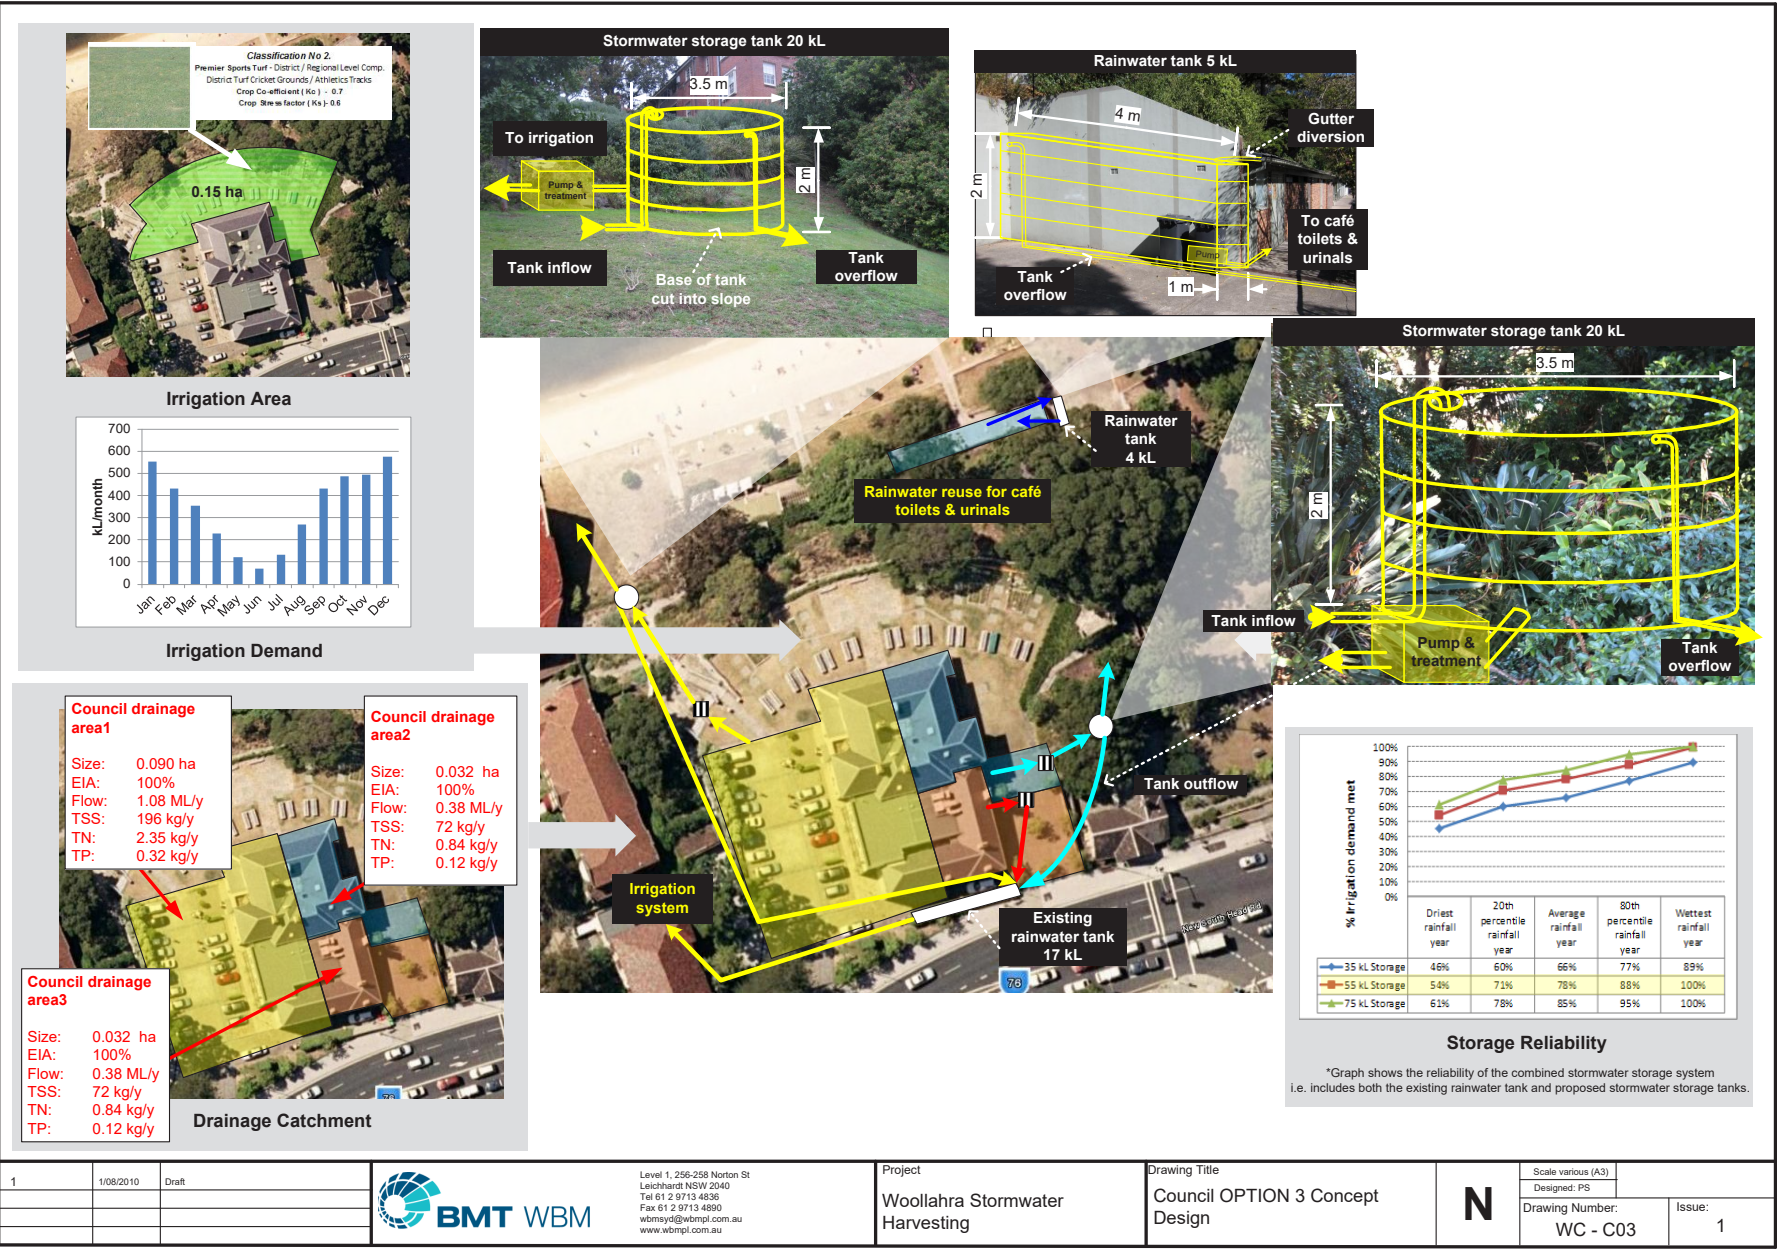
Preferred Redleaf stormwater harvesting scheme concept plan prepared by BMV WBM Pty Ltd, September 2010
